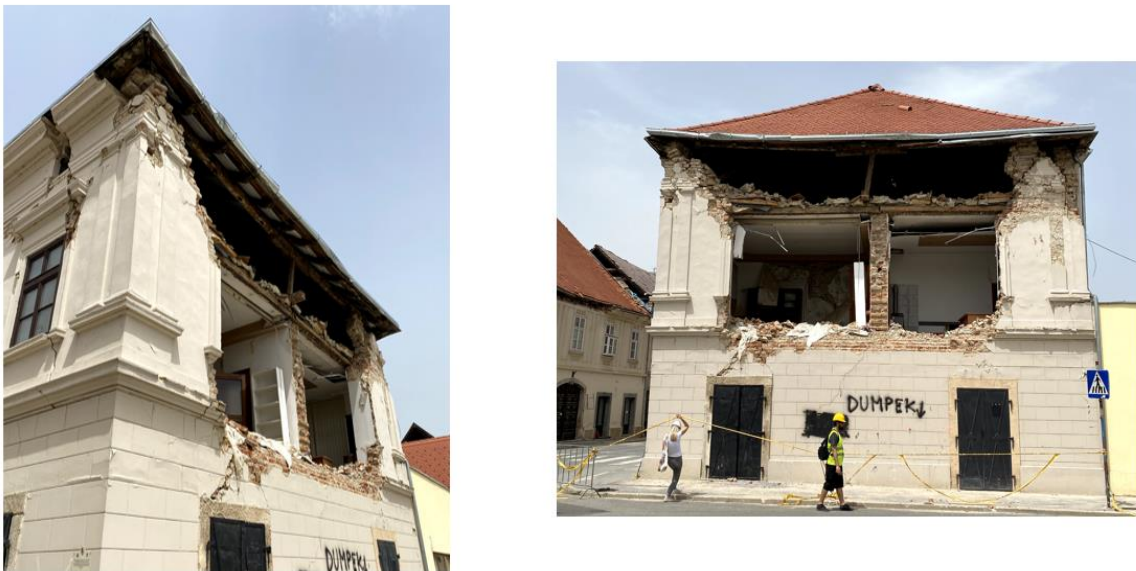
Out-of-plane mechanism of a damaged building in Petrinja, Croatia, this image belongs to the EESD repository.
